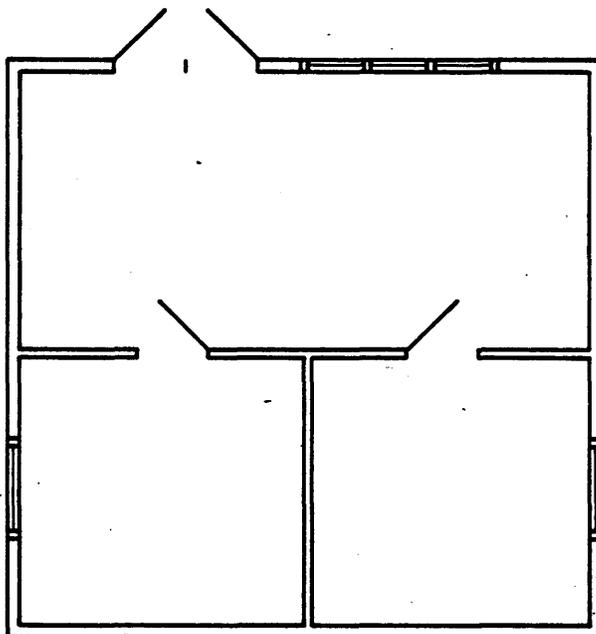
The Interior Wall Layout with Line Entities Trimmed
